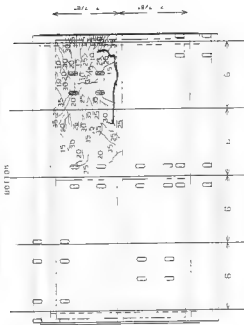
Bottom Cracking Pattern (Third Bridge - Test No 5)
